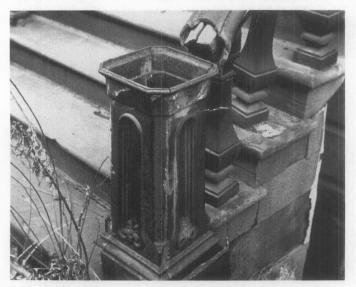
In an effort to repair this stair railing, concrete was poured around the wood spacer inside the railing casting. Water penetrated the railing and reacted with the concrete to accelerate the corrosion of the iron. Photo: John G. Waite.
